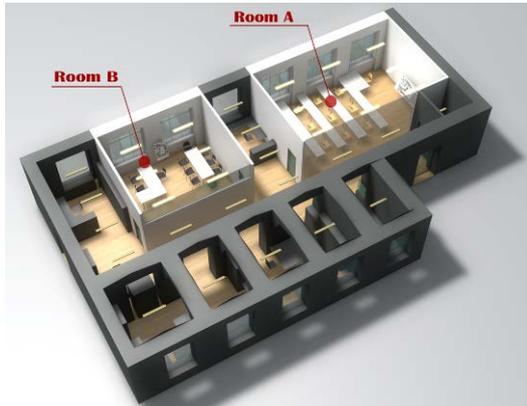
Room A (teaching and temporal working space) and room B (single office) within the Department of Building Physics and Building Ecology's offices.
